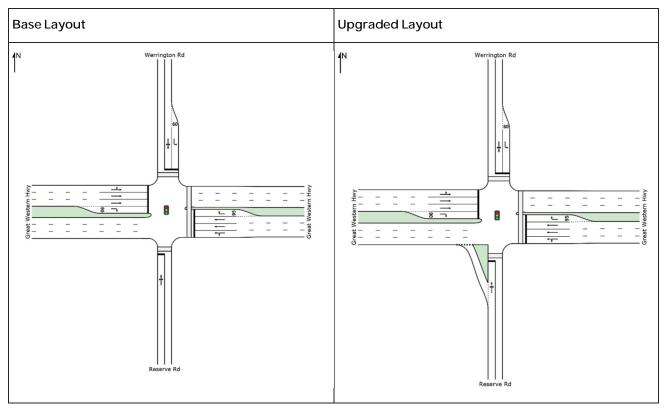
2031 with Links Road extension - Great Western Highway/Werrington Road
